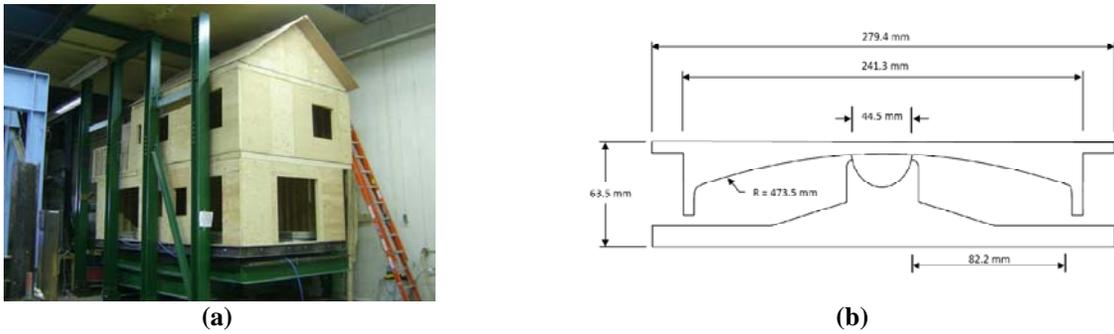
(a) Half-Scale Isolated Test Structure (b) Details of FPS bearing used for Testing.
